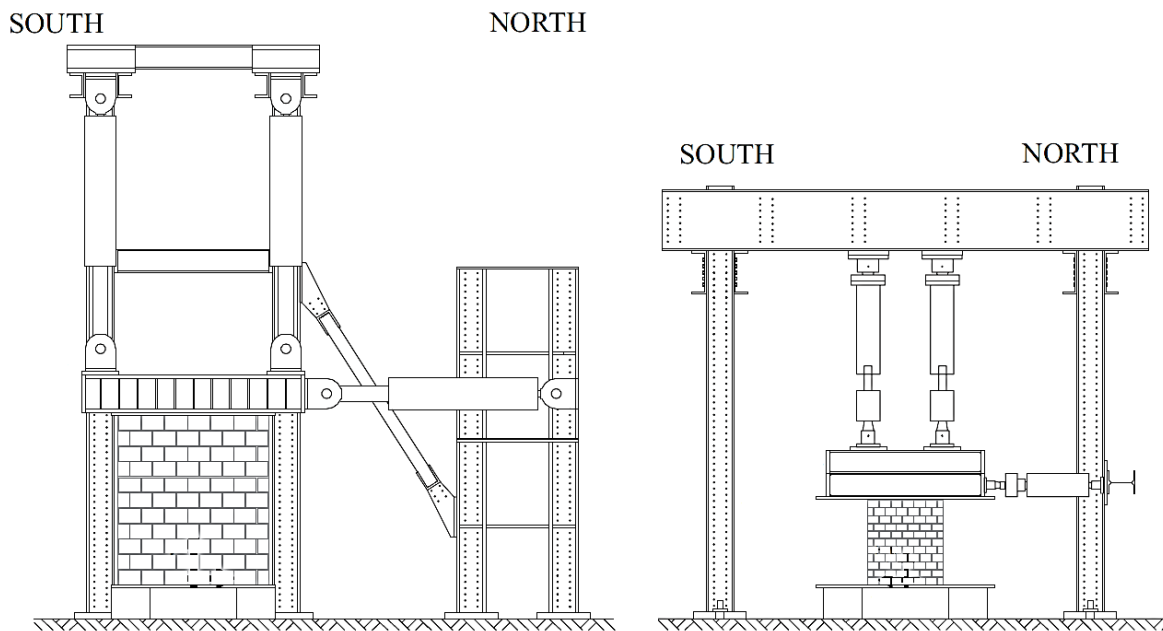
EPFL Test Set-ups for Full-scale and Half-scale Walls (Petry, 2015)
